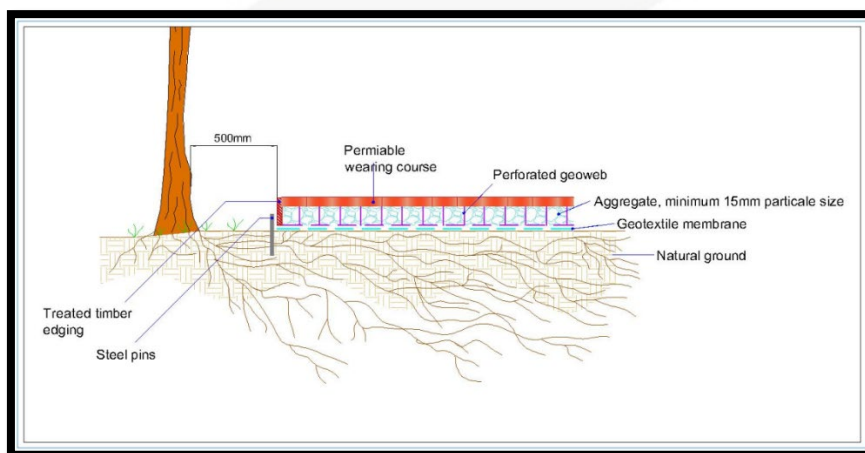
Typical cross section for multi-dimensional confinement system using timber edging
